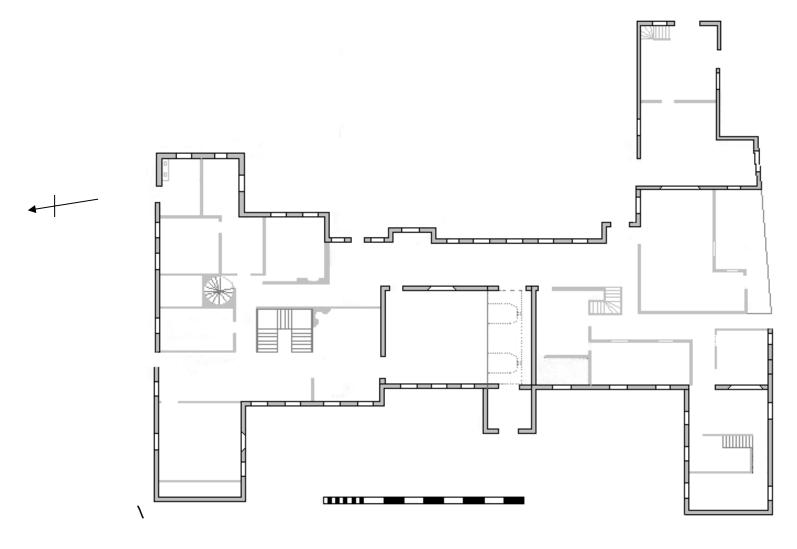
Plan of medieval Lackham House (date unknown) (redrawn by the author from the original, ref WANHS 1982.1863)
